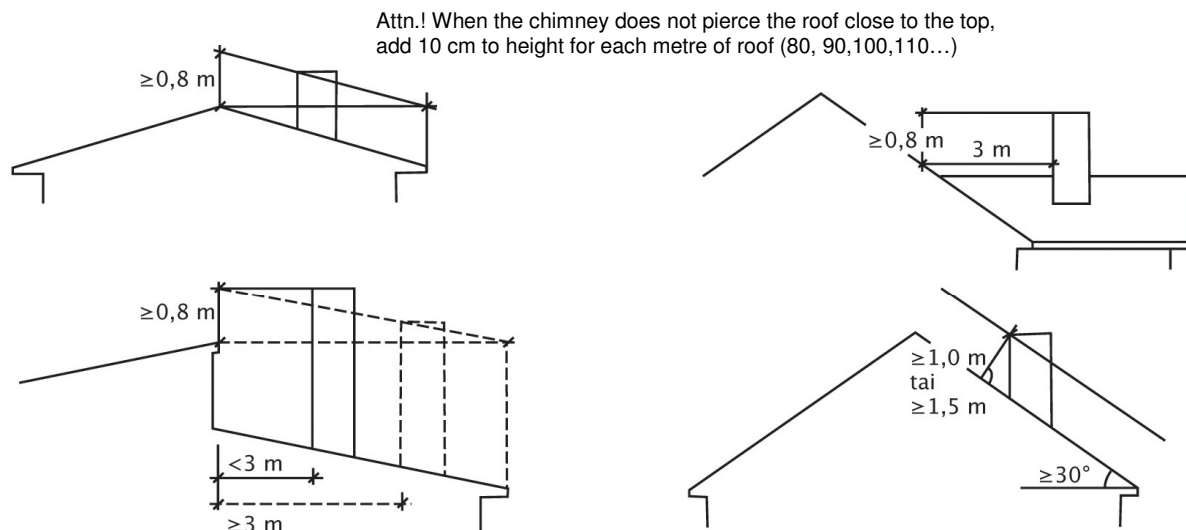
Instructions from the Finnish E3 building code regarding chimney height in relation with the roof's highest point.
